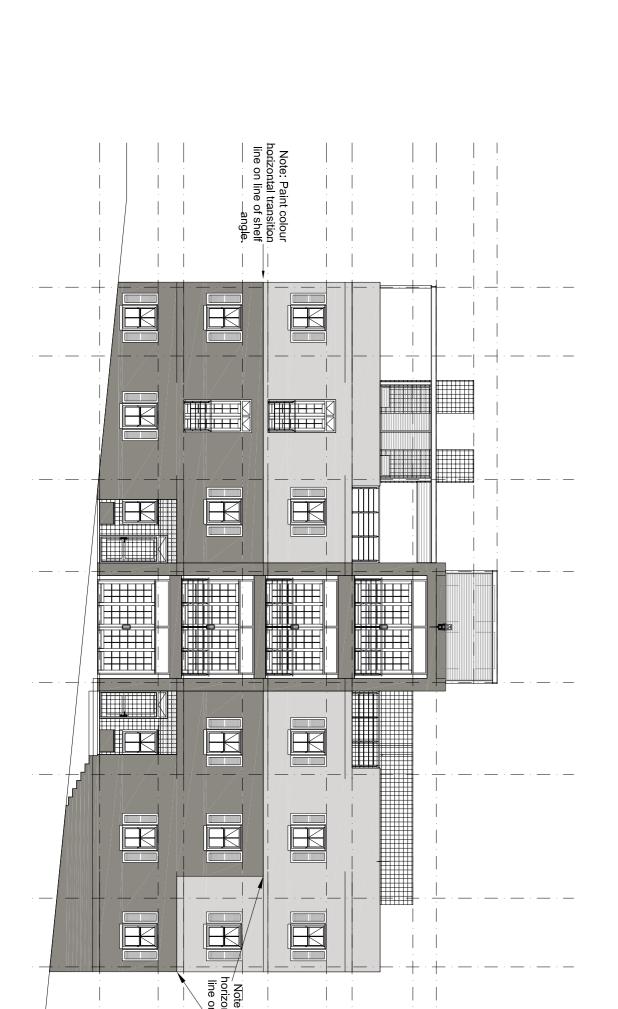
P3.2_ARC_CN_Q03 to be read together with drawing D6P3.2_ARC_CN_Q03_202. 201
